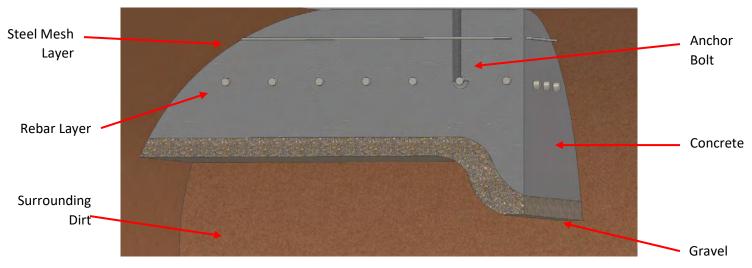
Slab-On-Grade Foundation (3D Cutaway View)
